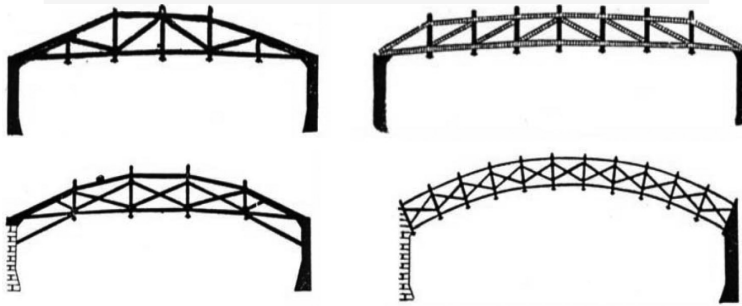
The wooden longitudinal truss girders proposed by Andrea Palladio as an alternative structural system for the timber bridge built over the Cismone River in North East Italy (published in “I quattro libri dell’architettura”, libro VII, in the year 1570) – selected drawings, according to [4]
